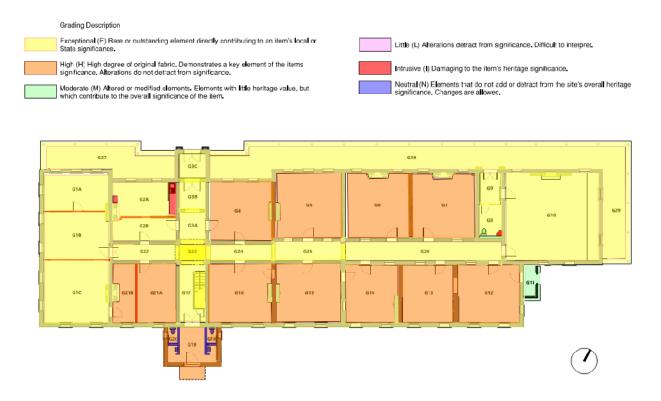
Significance Plans- CME Building Ground Floor (Source: CCG Architects with Curio additions)
